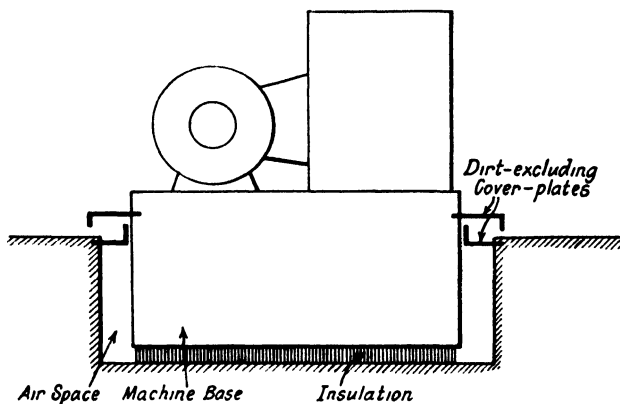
COVER PLATES DESIGNED TO AVOID RIGID CONNEXION BETWEEN INSULATED MACHINE AND FLOOR
